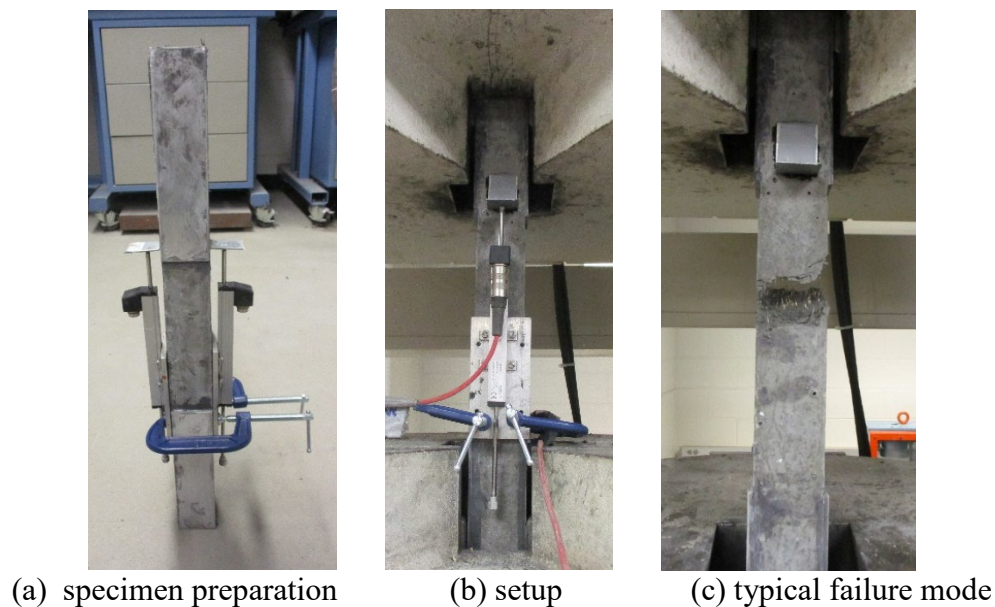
Direct tension test specimen preparation, setup, and typical failure mode
